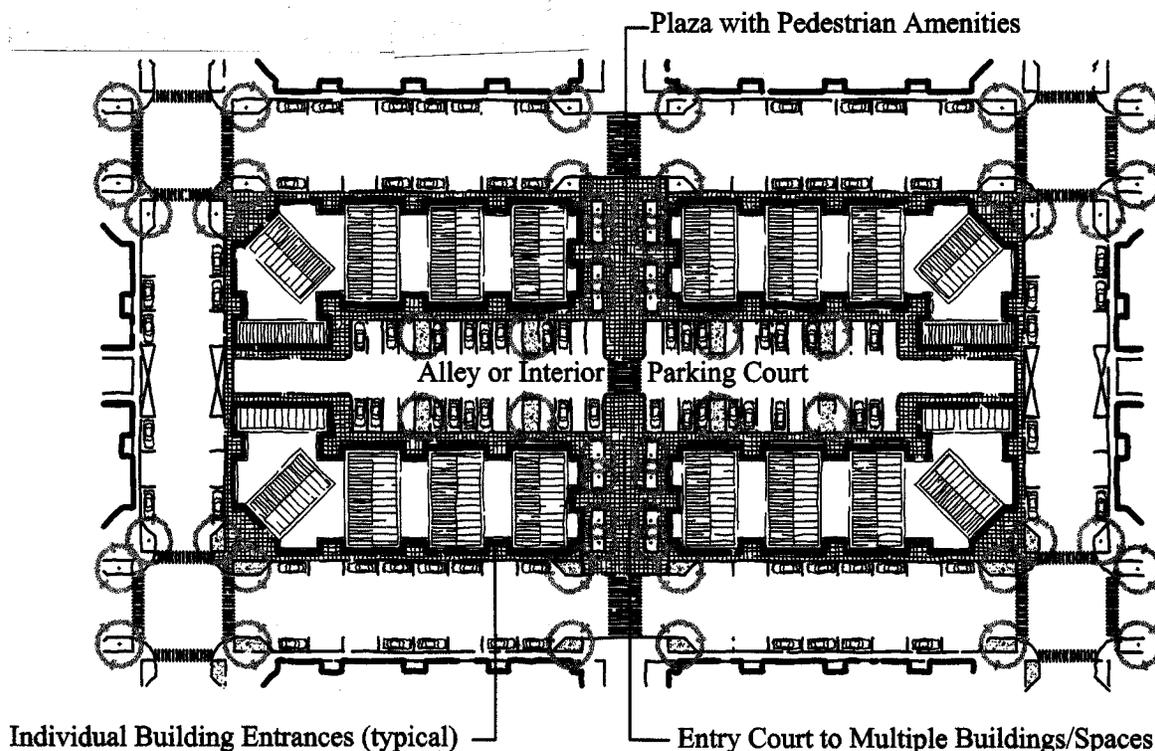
C(2) – Building Orientation With Internal Parking
